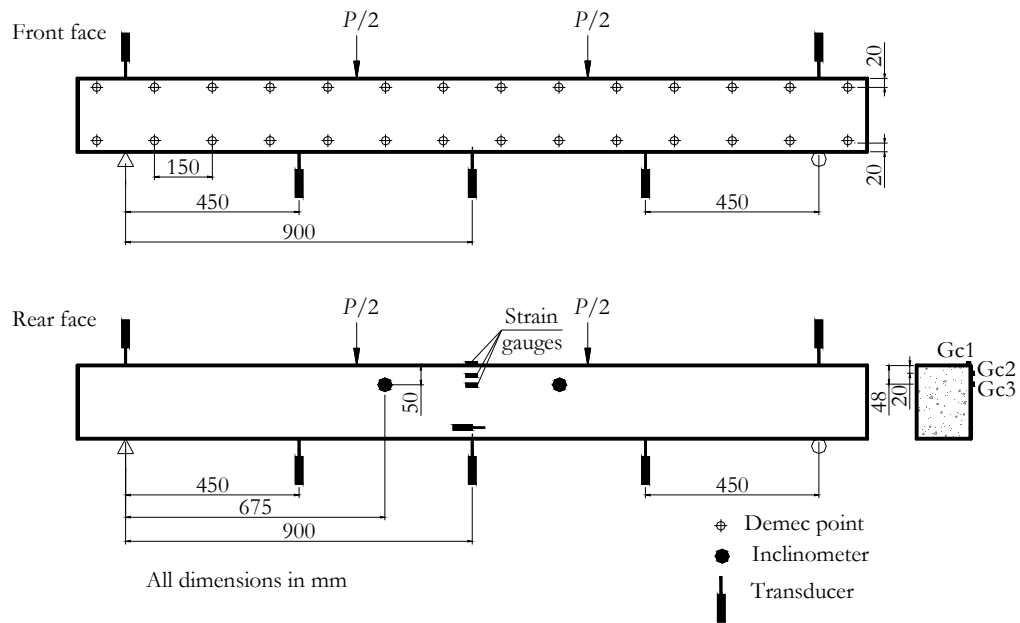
Instrumentation details for beam C1-316-D1-B.
